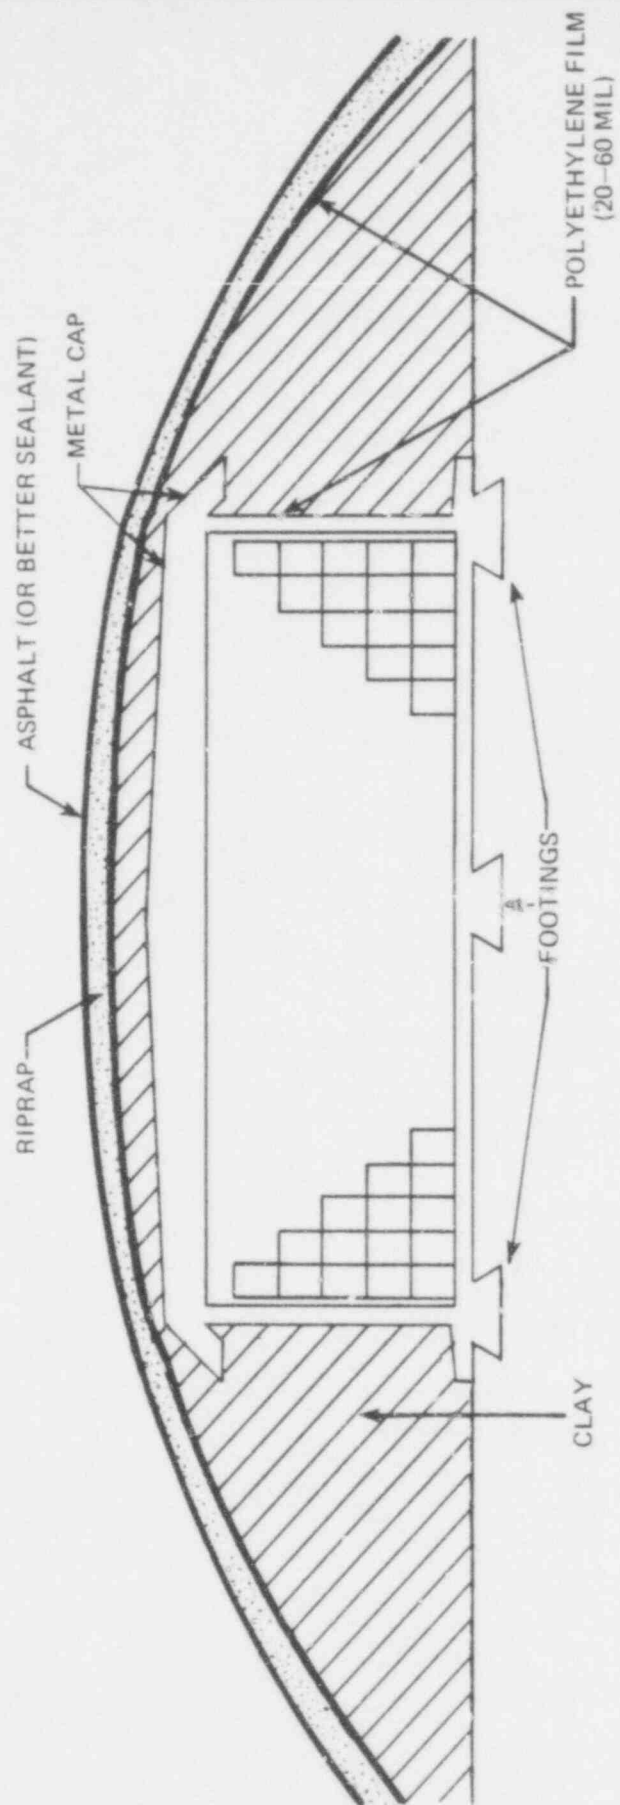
THE COVERED STRUCTURAL DISPOSAL FACILITY
